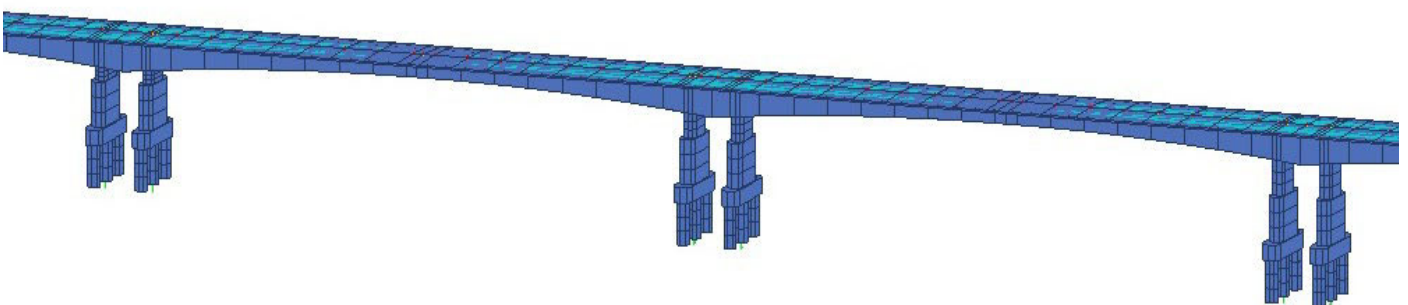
Construction stages and stressing were carried out using RM Bridge software
